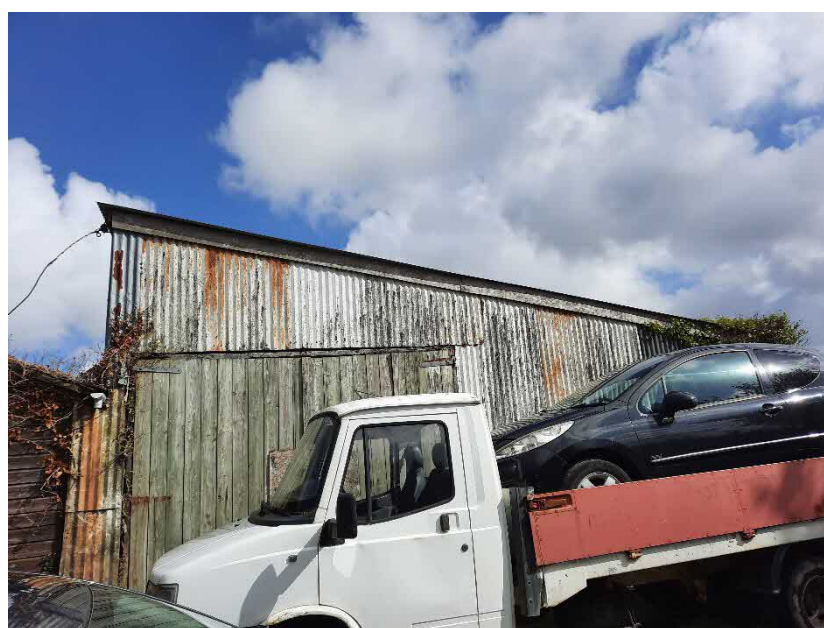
View of the western elevation of the corrugated metal workshop at Vigus Stores.
